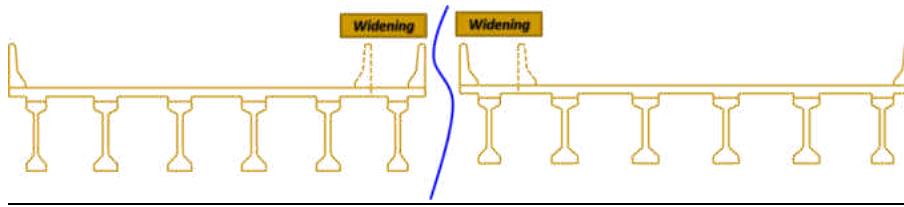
Option I – Ext. Bridge Widening Exp. (Inside Widening)
